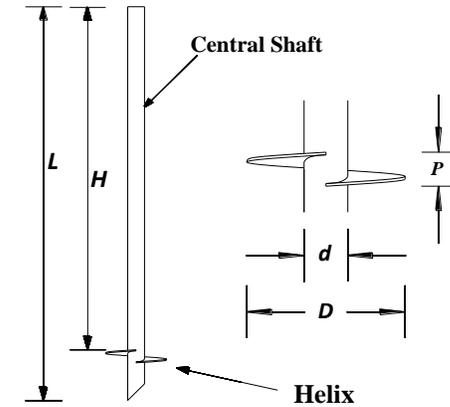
Sketch of the single-helix piles used for in-situ load tests and numerical modeling (not to scale)
